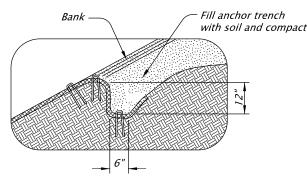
TOP OF BANK ANCHOR TRENCH, H<3'
